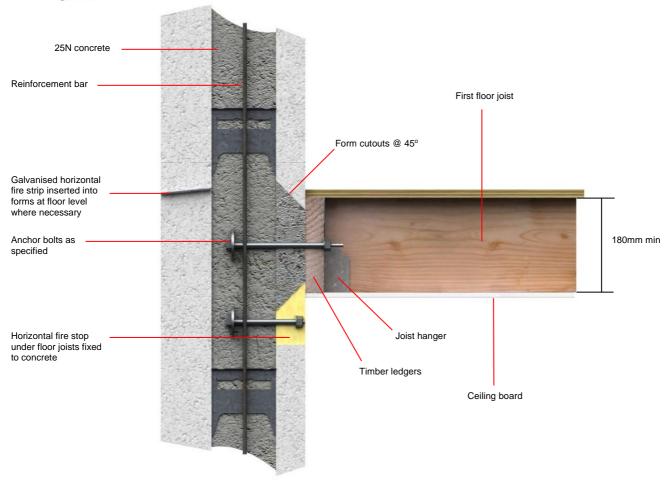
Wall to Joist Details - Joist Hangers on Anchored Ledgers
